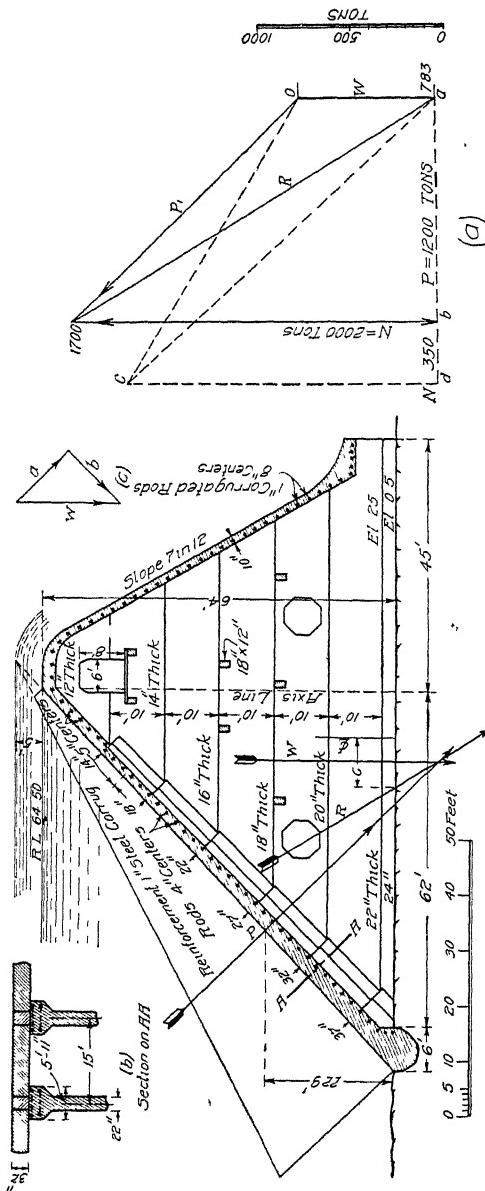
Profile and Force Diagram of Ellsworth Dam
